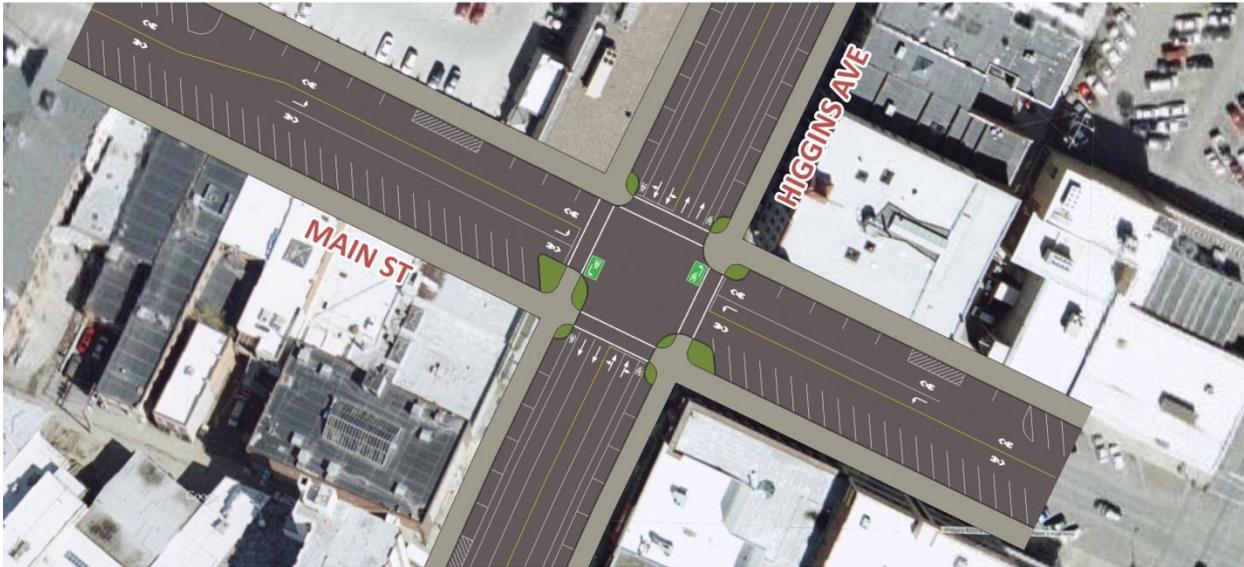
Higgins Avenue Option 1 - Refined, Main Street Intersection
